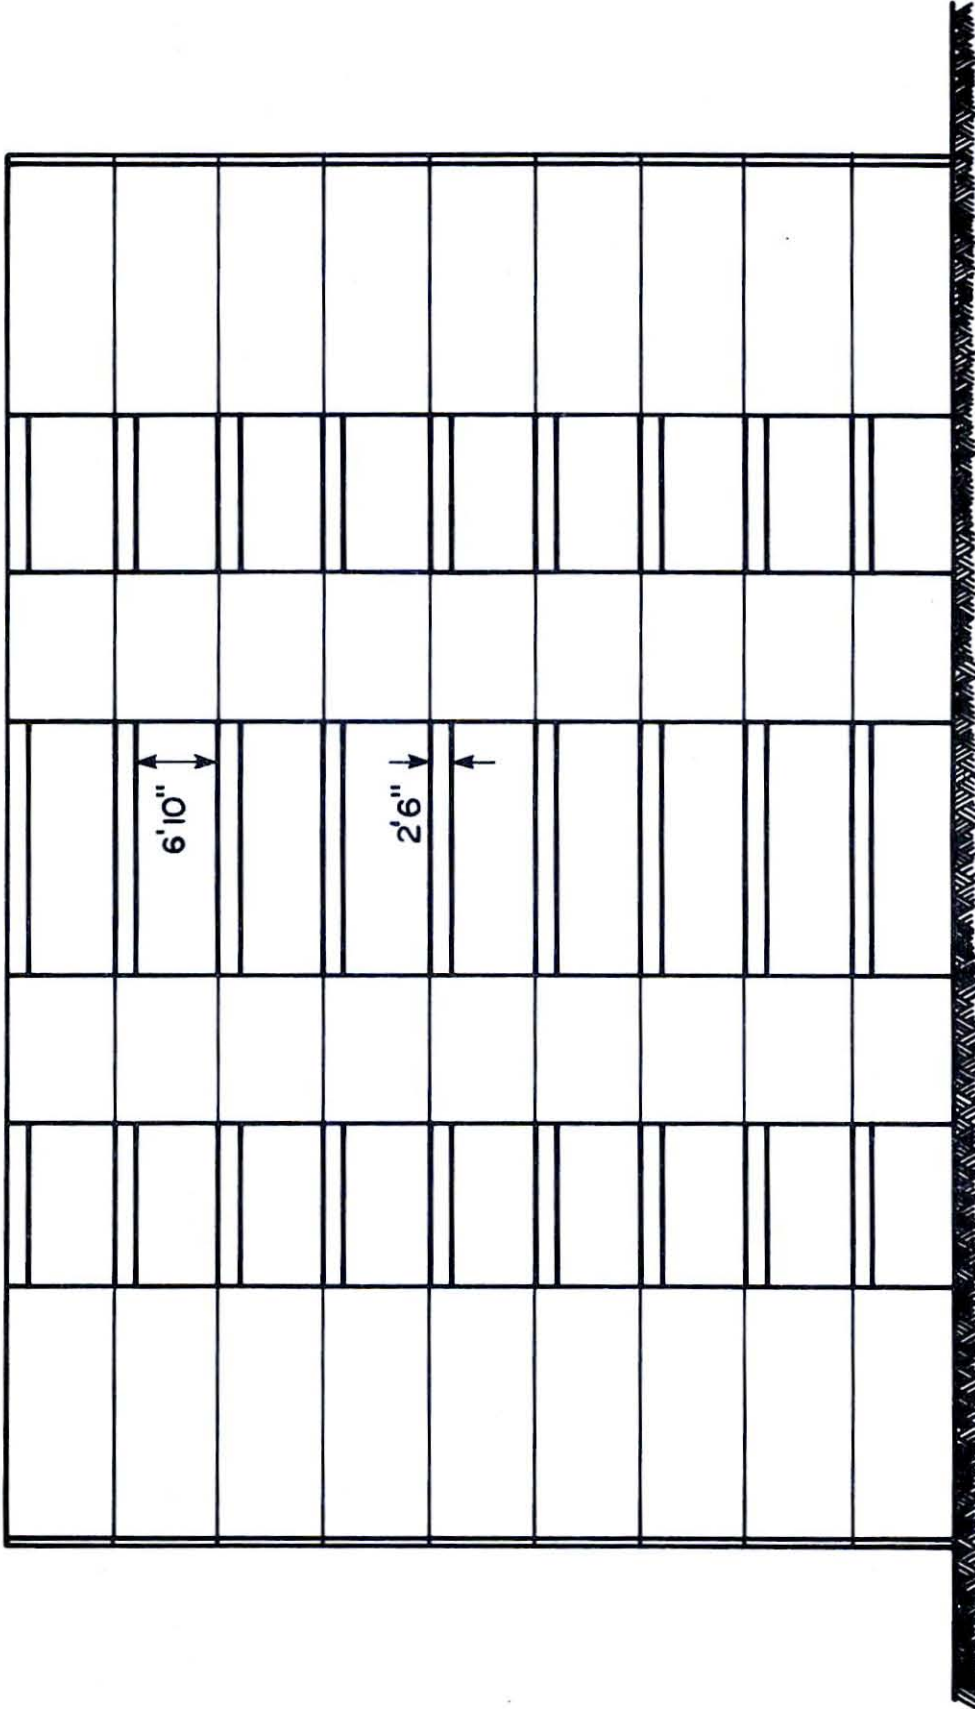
INTERIOR FRAME (LONGITUDINAL DIRECTION)
